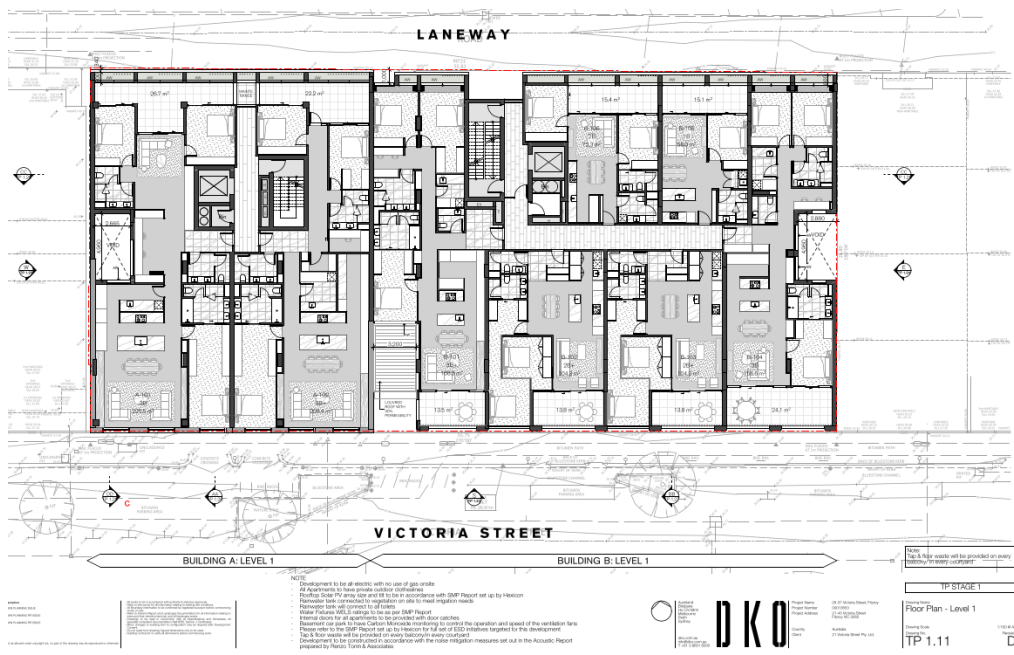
Proposed Level 1 - 25-37 Victoria Street
